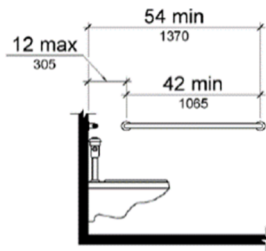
Side Wall Grab Bar at Water Closets
